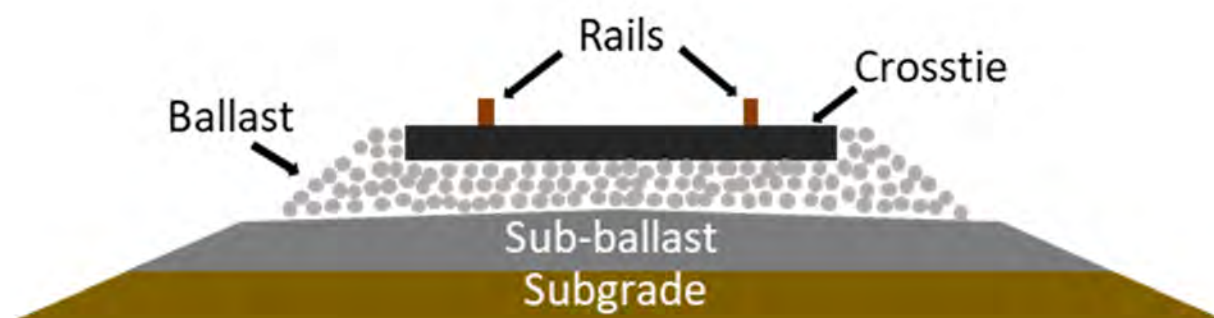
Typical railroad track cross-section showing the main components of the track structure.
